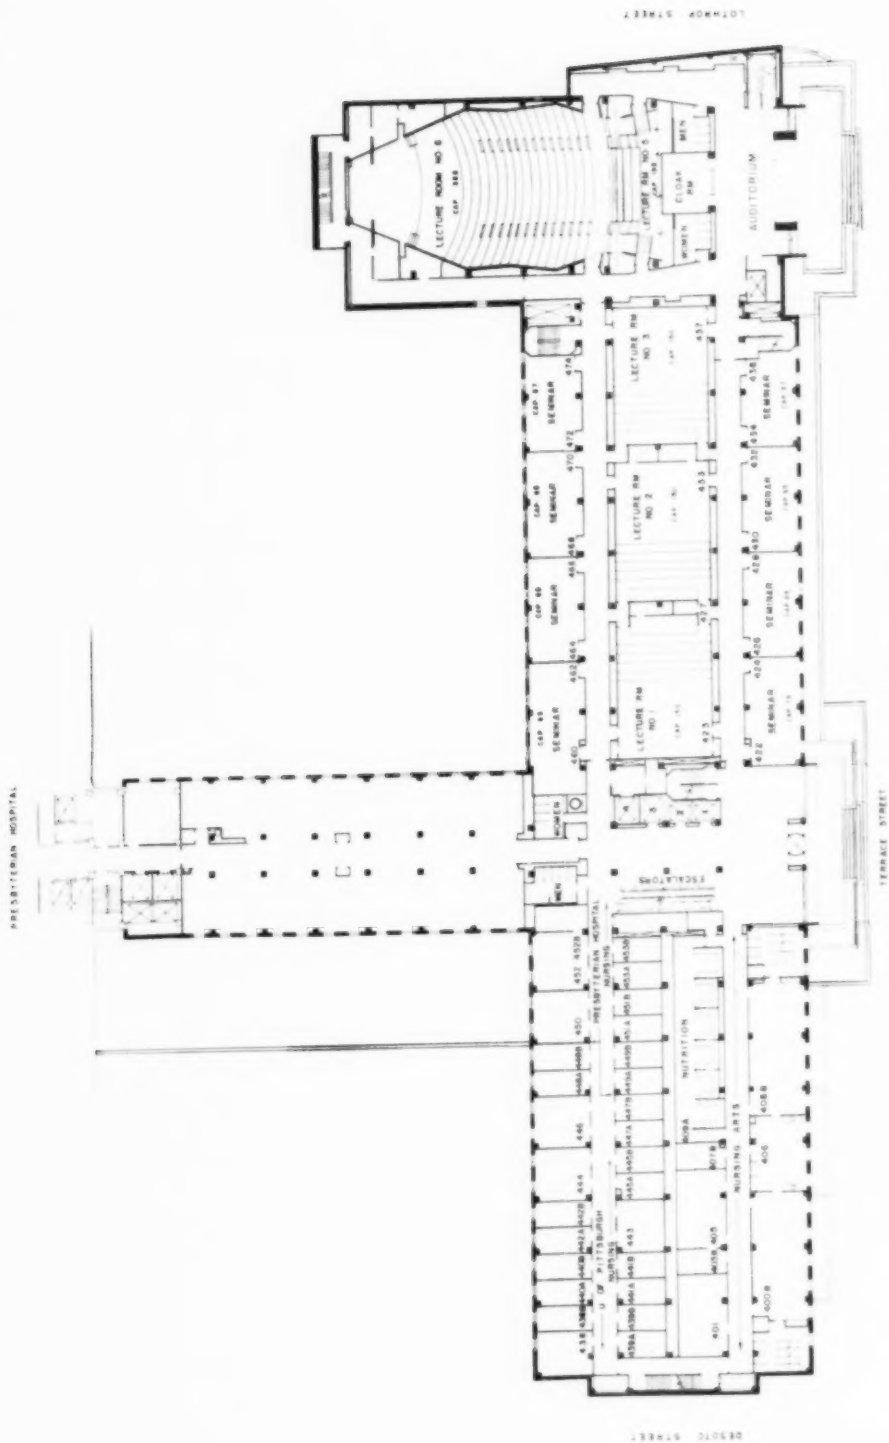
FOURTH FLOOR PLAN, SCHOOLS OF THE HEALTH PROFESSIONS BUILDING,
